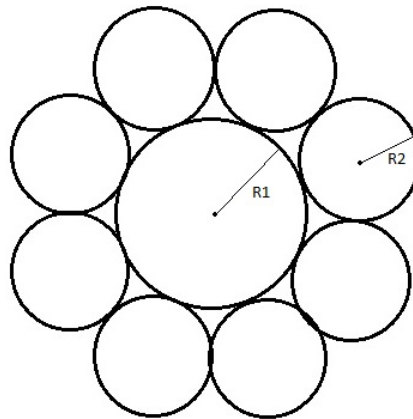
Bridge support structure concept: Pontoon 8+1 Cylinder
